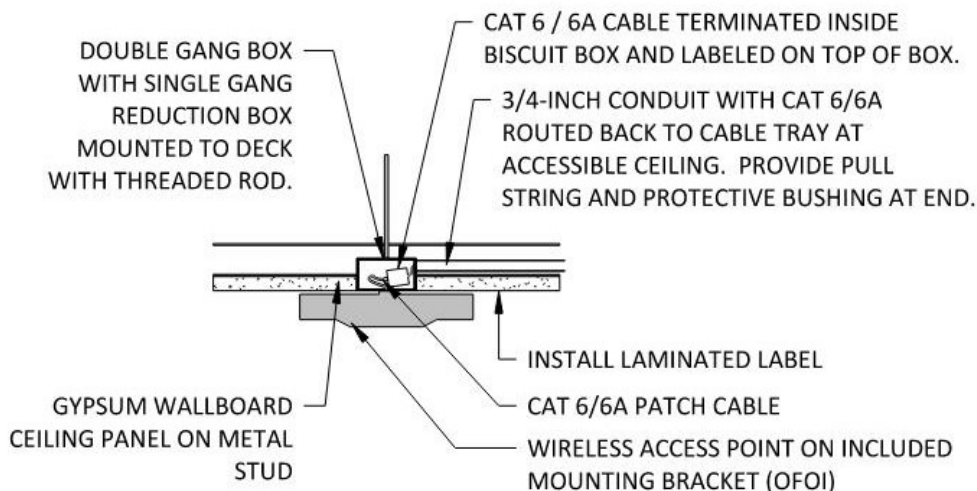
WAP Mounting – Exposed Ceiling: This diagram shows a section cut through a typical wireless access point (WAP) installed in an exposed ceiling condition. The WAP (OFOI) has an included mounting bracket that attaches to a double gang box or 4S box with single gang reduction box, mounted to deck with a threaded rod. From the WAP is a CAT 6/6A patch cable that will terminate inside a biscuit box with label. The cable will route through a 3/4-inch conduit back to a cable tray. The conduit has a pull string and protective bushing at the end.
